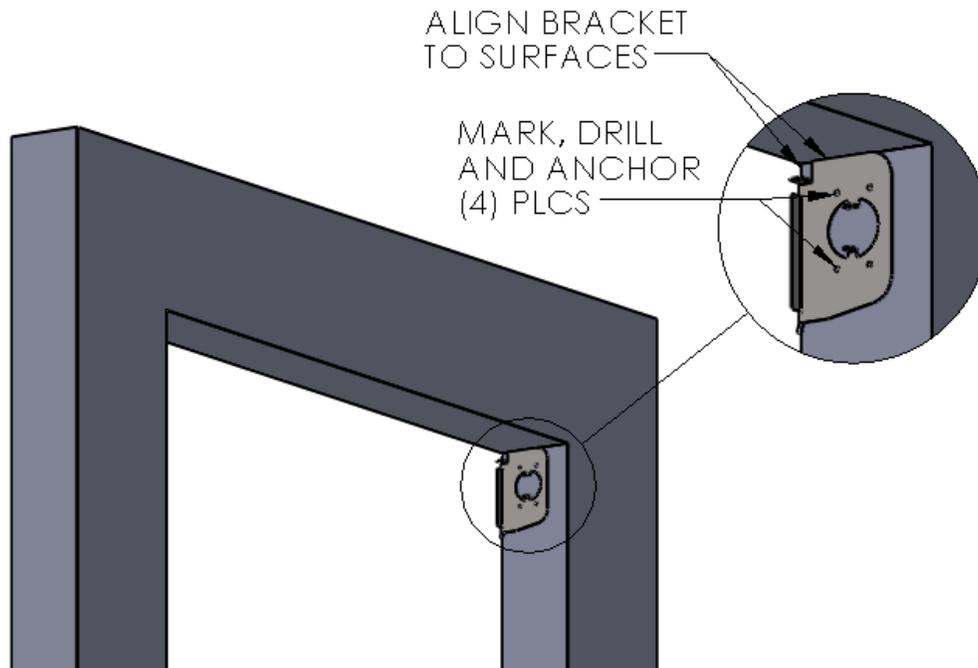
LOCATE & INSTALL R.H. HEADER MOUNTING BRACKET
